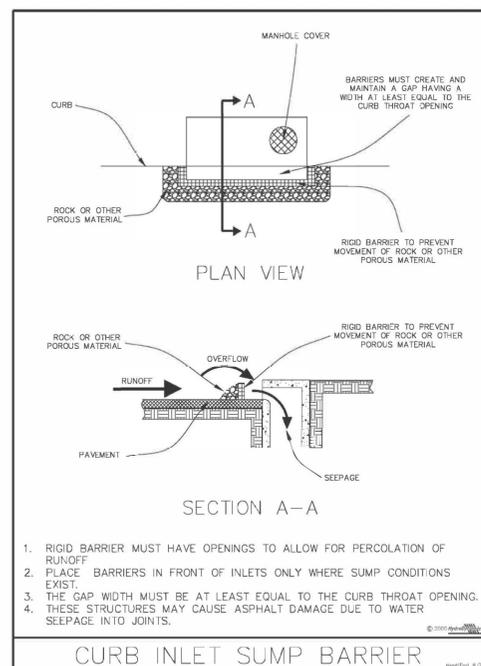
Illustration of a Curb Inlet "Sump" Barrier
